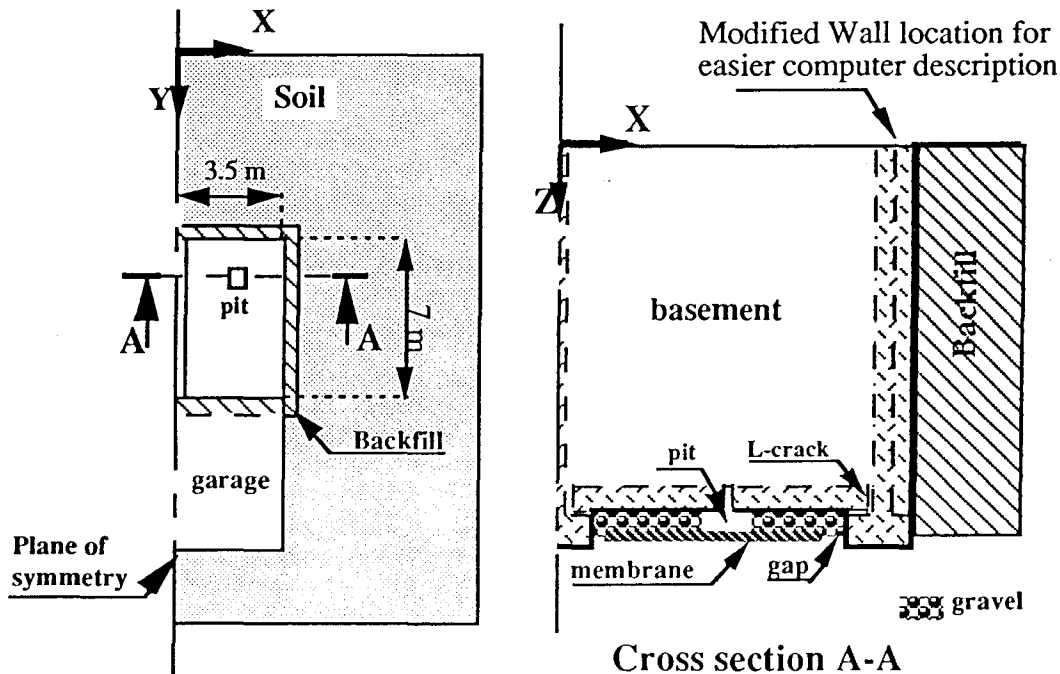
The plan and the section of the “typical” house modeled for the parametric simulations with Non-Darcy STAR. Owing to the assumed plane of symmetry of the house, only half of the house is shown in the plan and the section. The L-shaped crack dimensions are shown greatly exaggerated here for clearer illustration.
